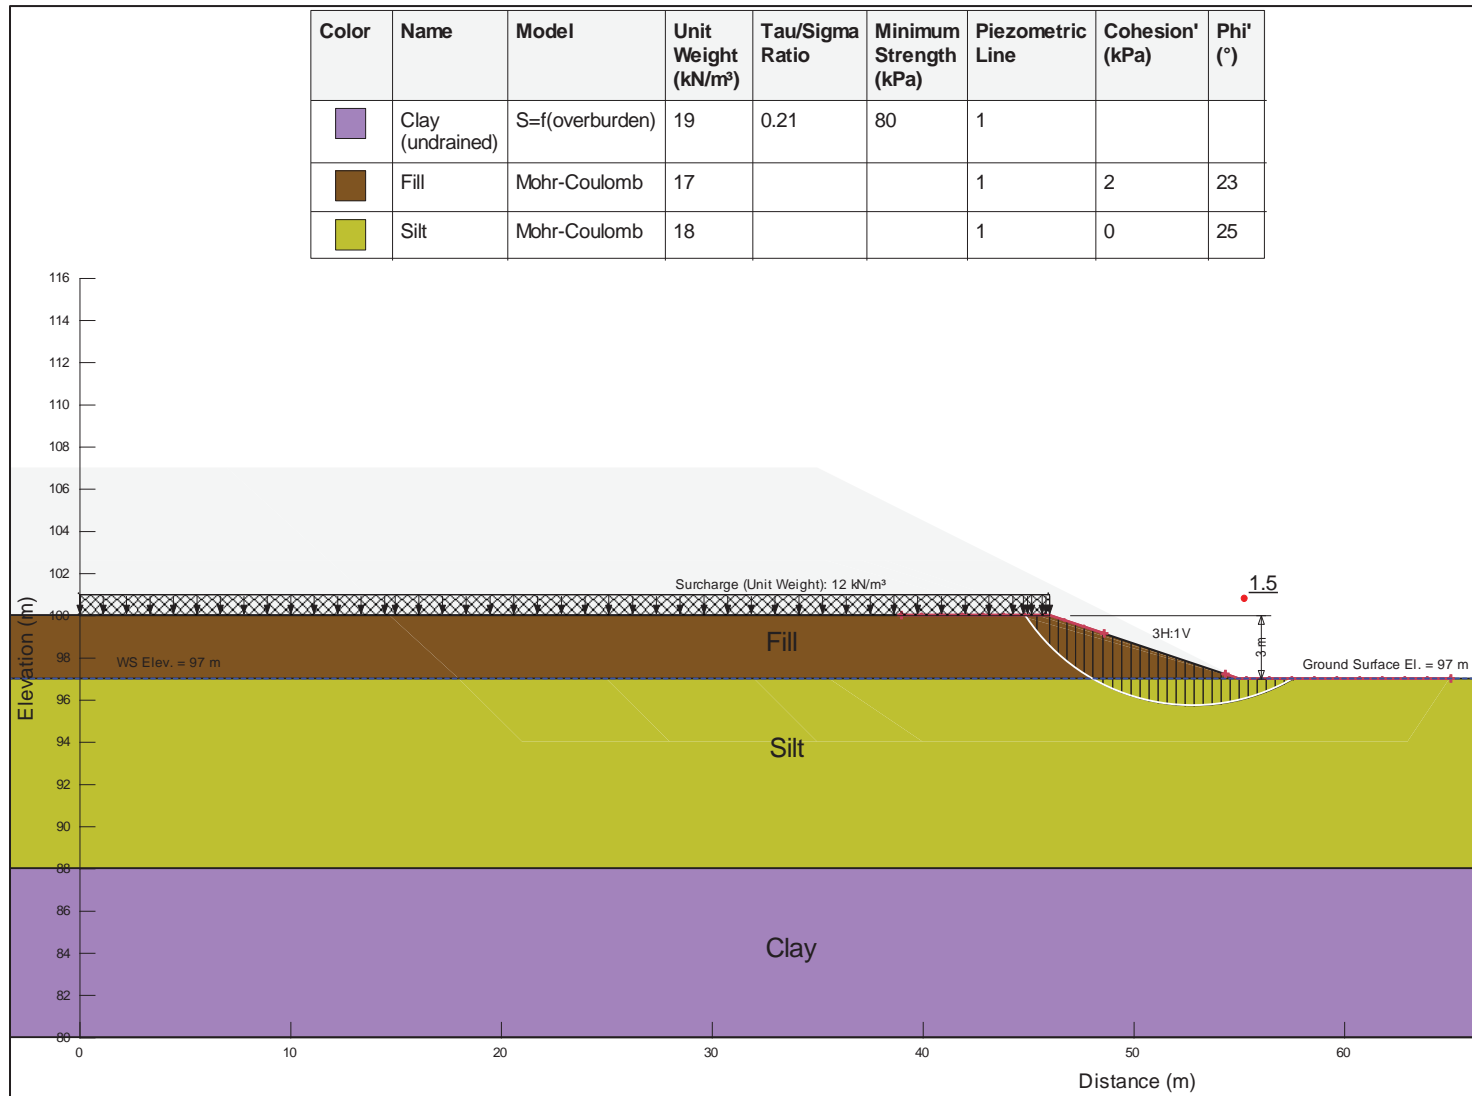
Rockcliffe Embankment End of Construction (Undrained) Case A1
